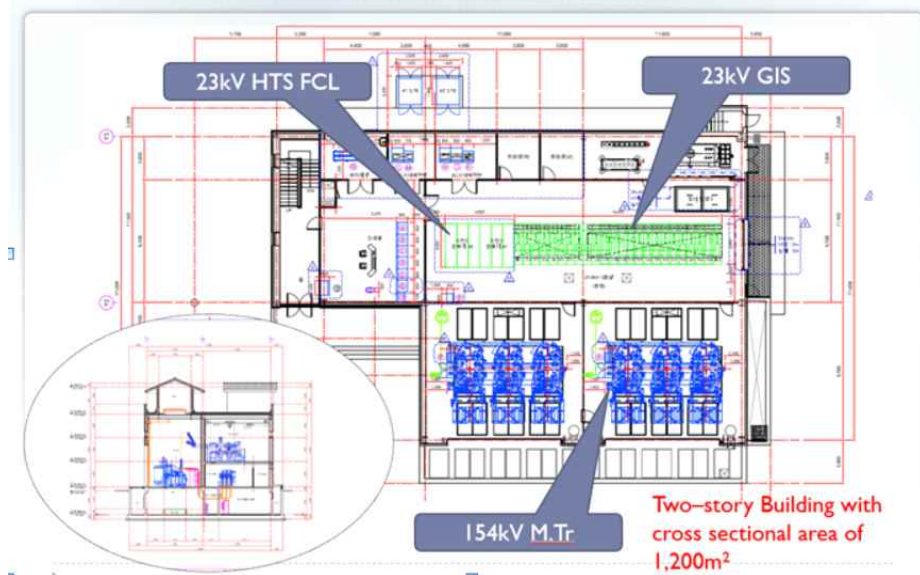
Layout of a small substation with two story building on the cross sectional area of 1,200 m<sup>2</sup>
